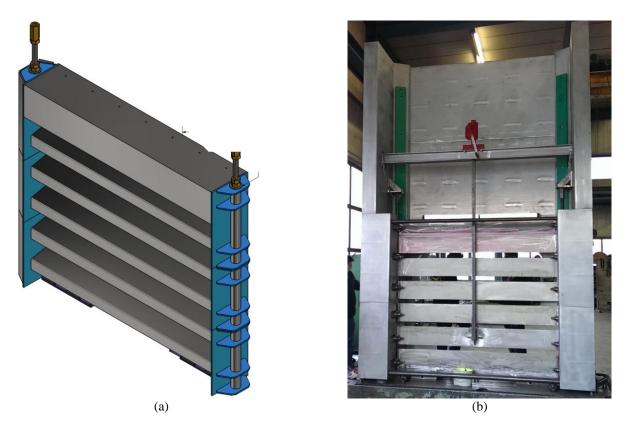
(a) isometric drawing of the diaphragm (drawing by Stahleinbau GmbH, CH-Stalden); (b); erected diaphragm at factory acceptance
